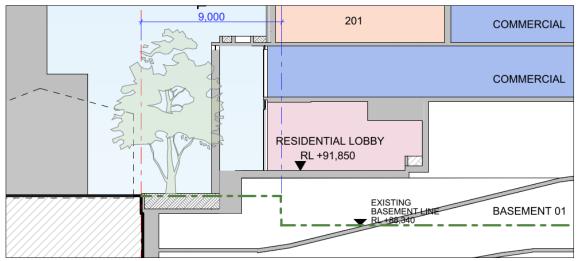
Extract from Section A (SSDA 205) from Appendix D Architectural Plans; shallow soil area and isolated from opportunity to connect with landscape area on neighbouring site.
